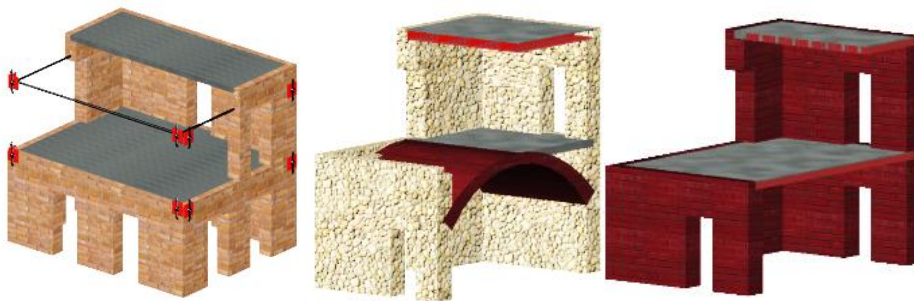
Examples of parameters implemented into structural models, a) Steel ties, b) masonry barrel vaults, c) type of floor.
